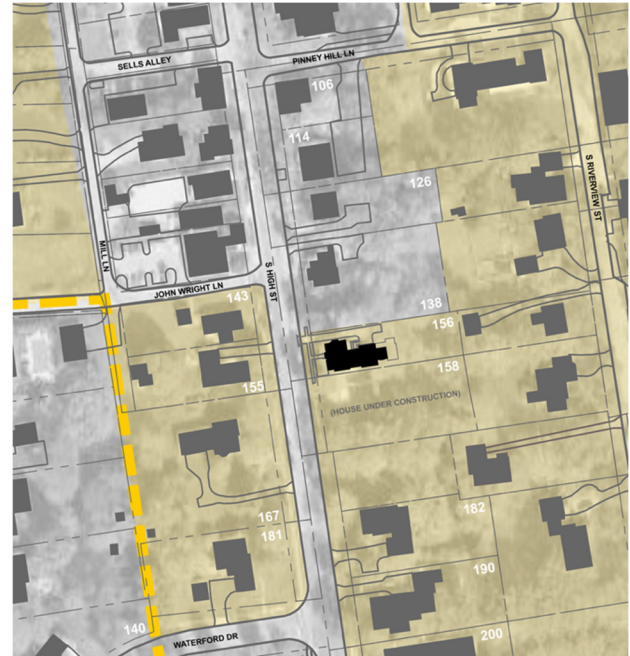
Detail view of the buildings immediately around 156 S. High Street. The proposed building is shown in its approximate placement on the lot.
